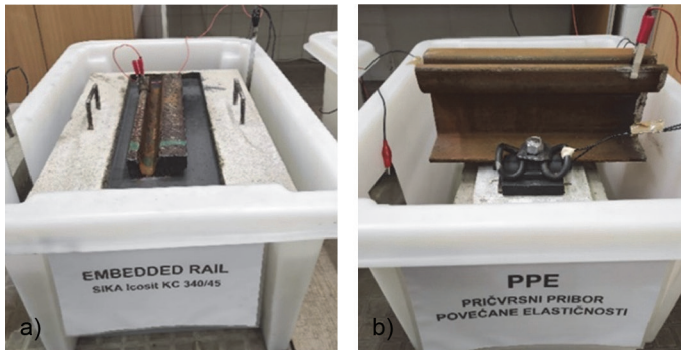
Testing samples, a) embedded track, b) PPE fastening system
